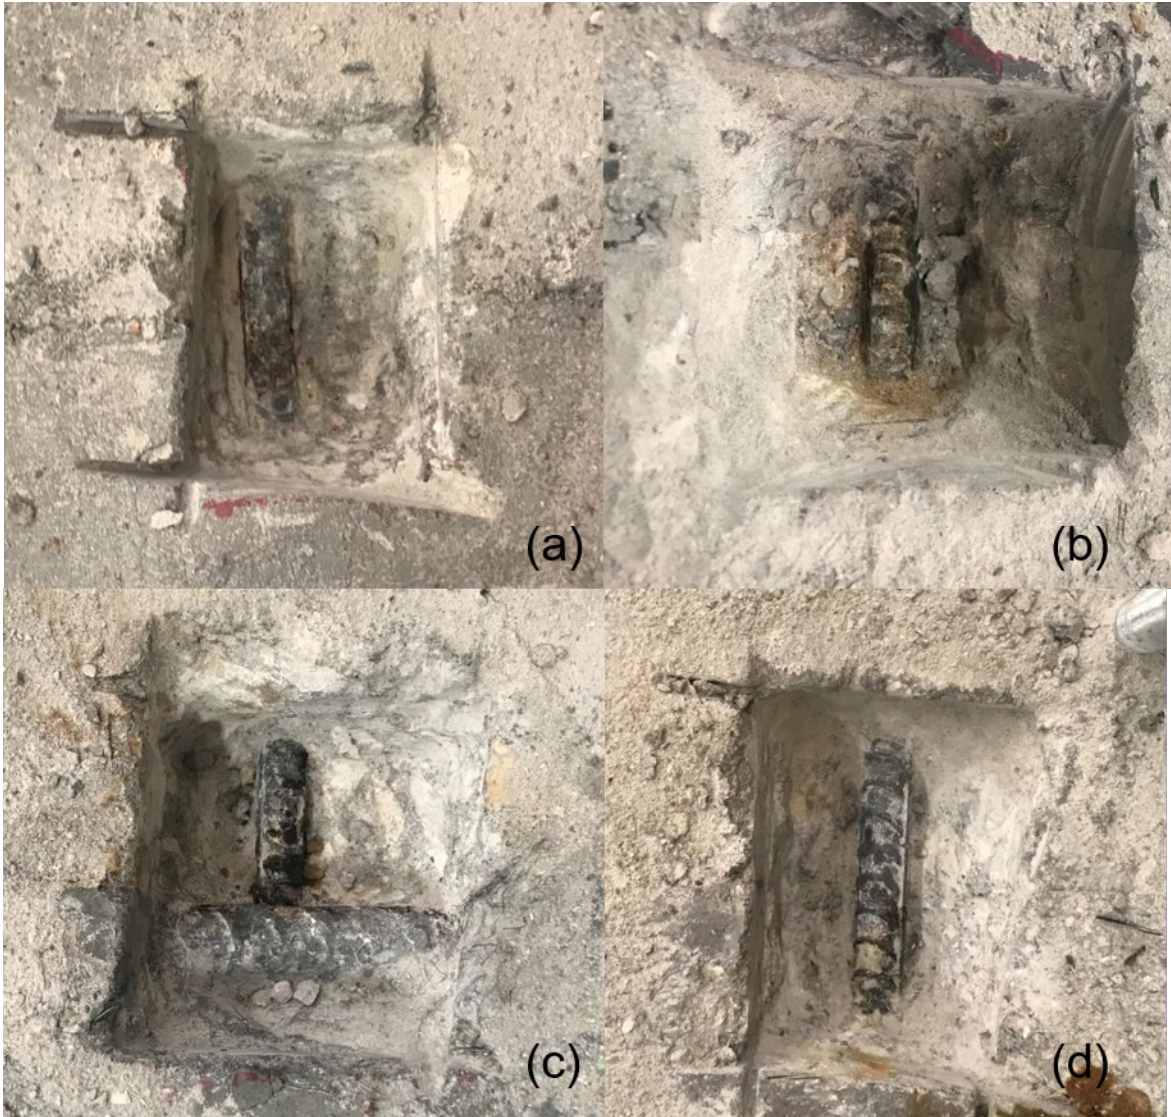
Fourth rebar excavation for large-scale corrosion specimens using (a) ODOT AA, (b) J3, (c) Ductal®, and (d) Phoscrete®
